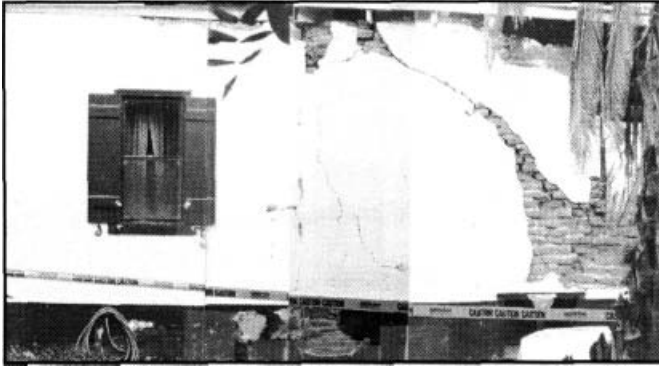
Exterior elevation of the west wall of the bedroom at the southwest corner of the residence. The diagonal crack is a shear crack with a permanent offset of approximately 2 inches.
